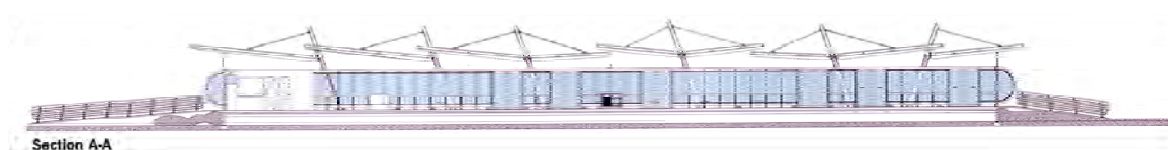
Typical cross section through a Rea Vaya Station. (Manning, 2009: 128)
